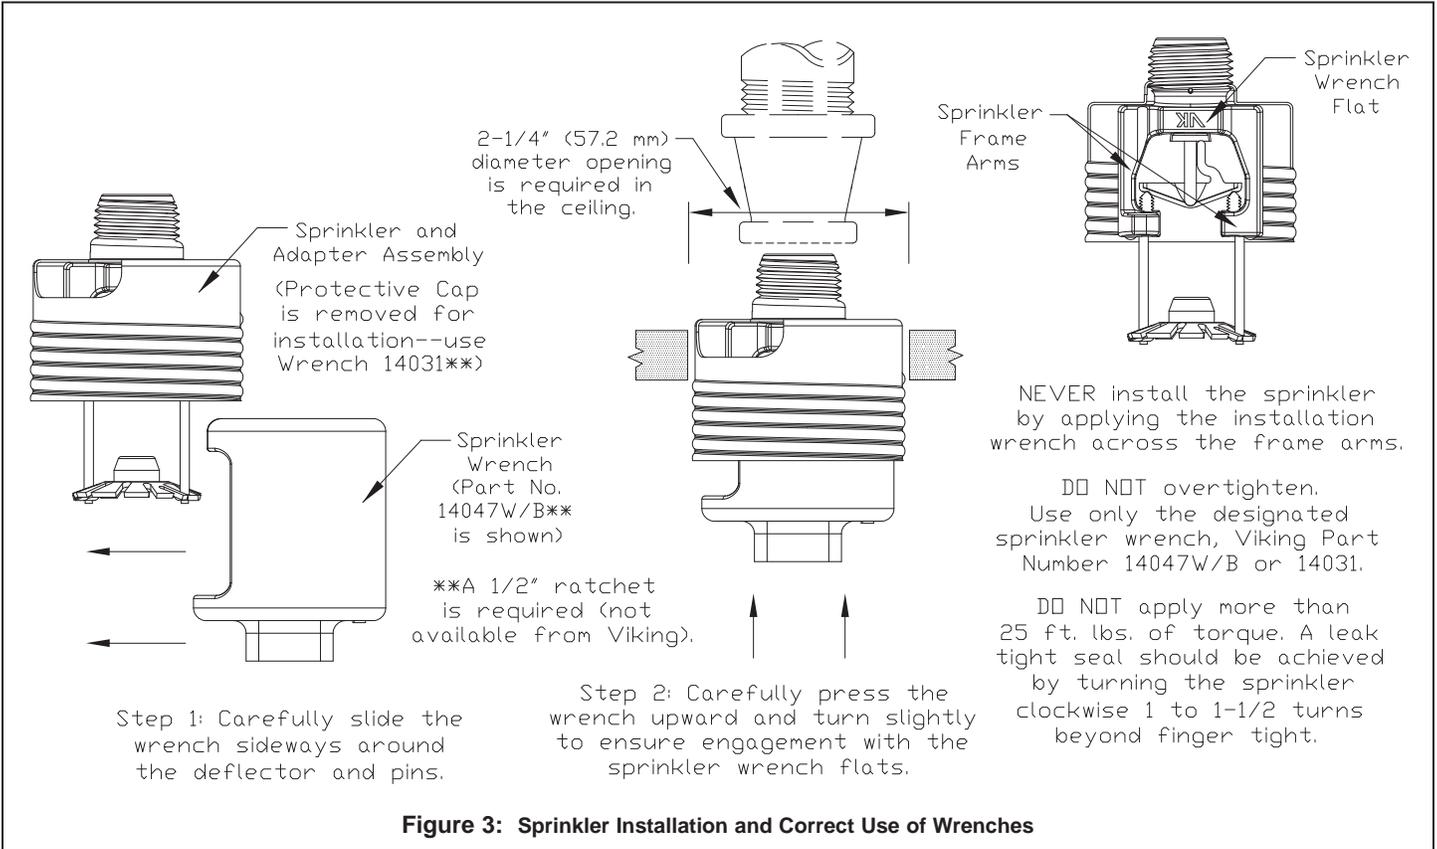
Sprinkler Installation and Correct Use of Wrenches
